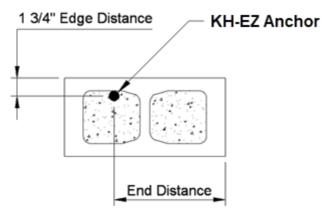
EDGE AND END DISTANCES FOR THE KH-EZ, KH-EZ CRC AND KH-EZ SS316 ANCHORS INSTALLED IN THE TOP OF CMU MASONRY WALL CONSTRUCTION
